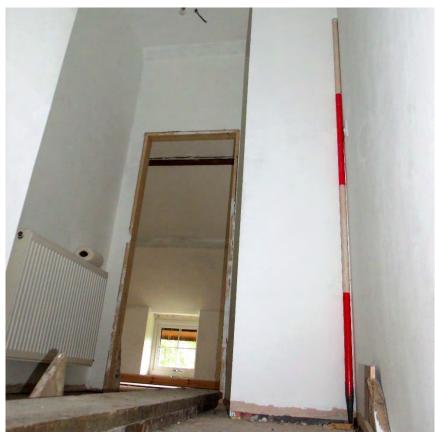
Interior, landing at first floor and entrance of Room 1; view towards S. 2m scale.
